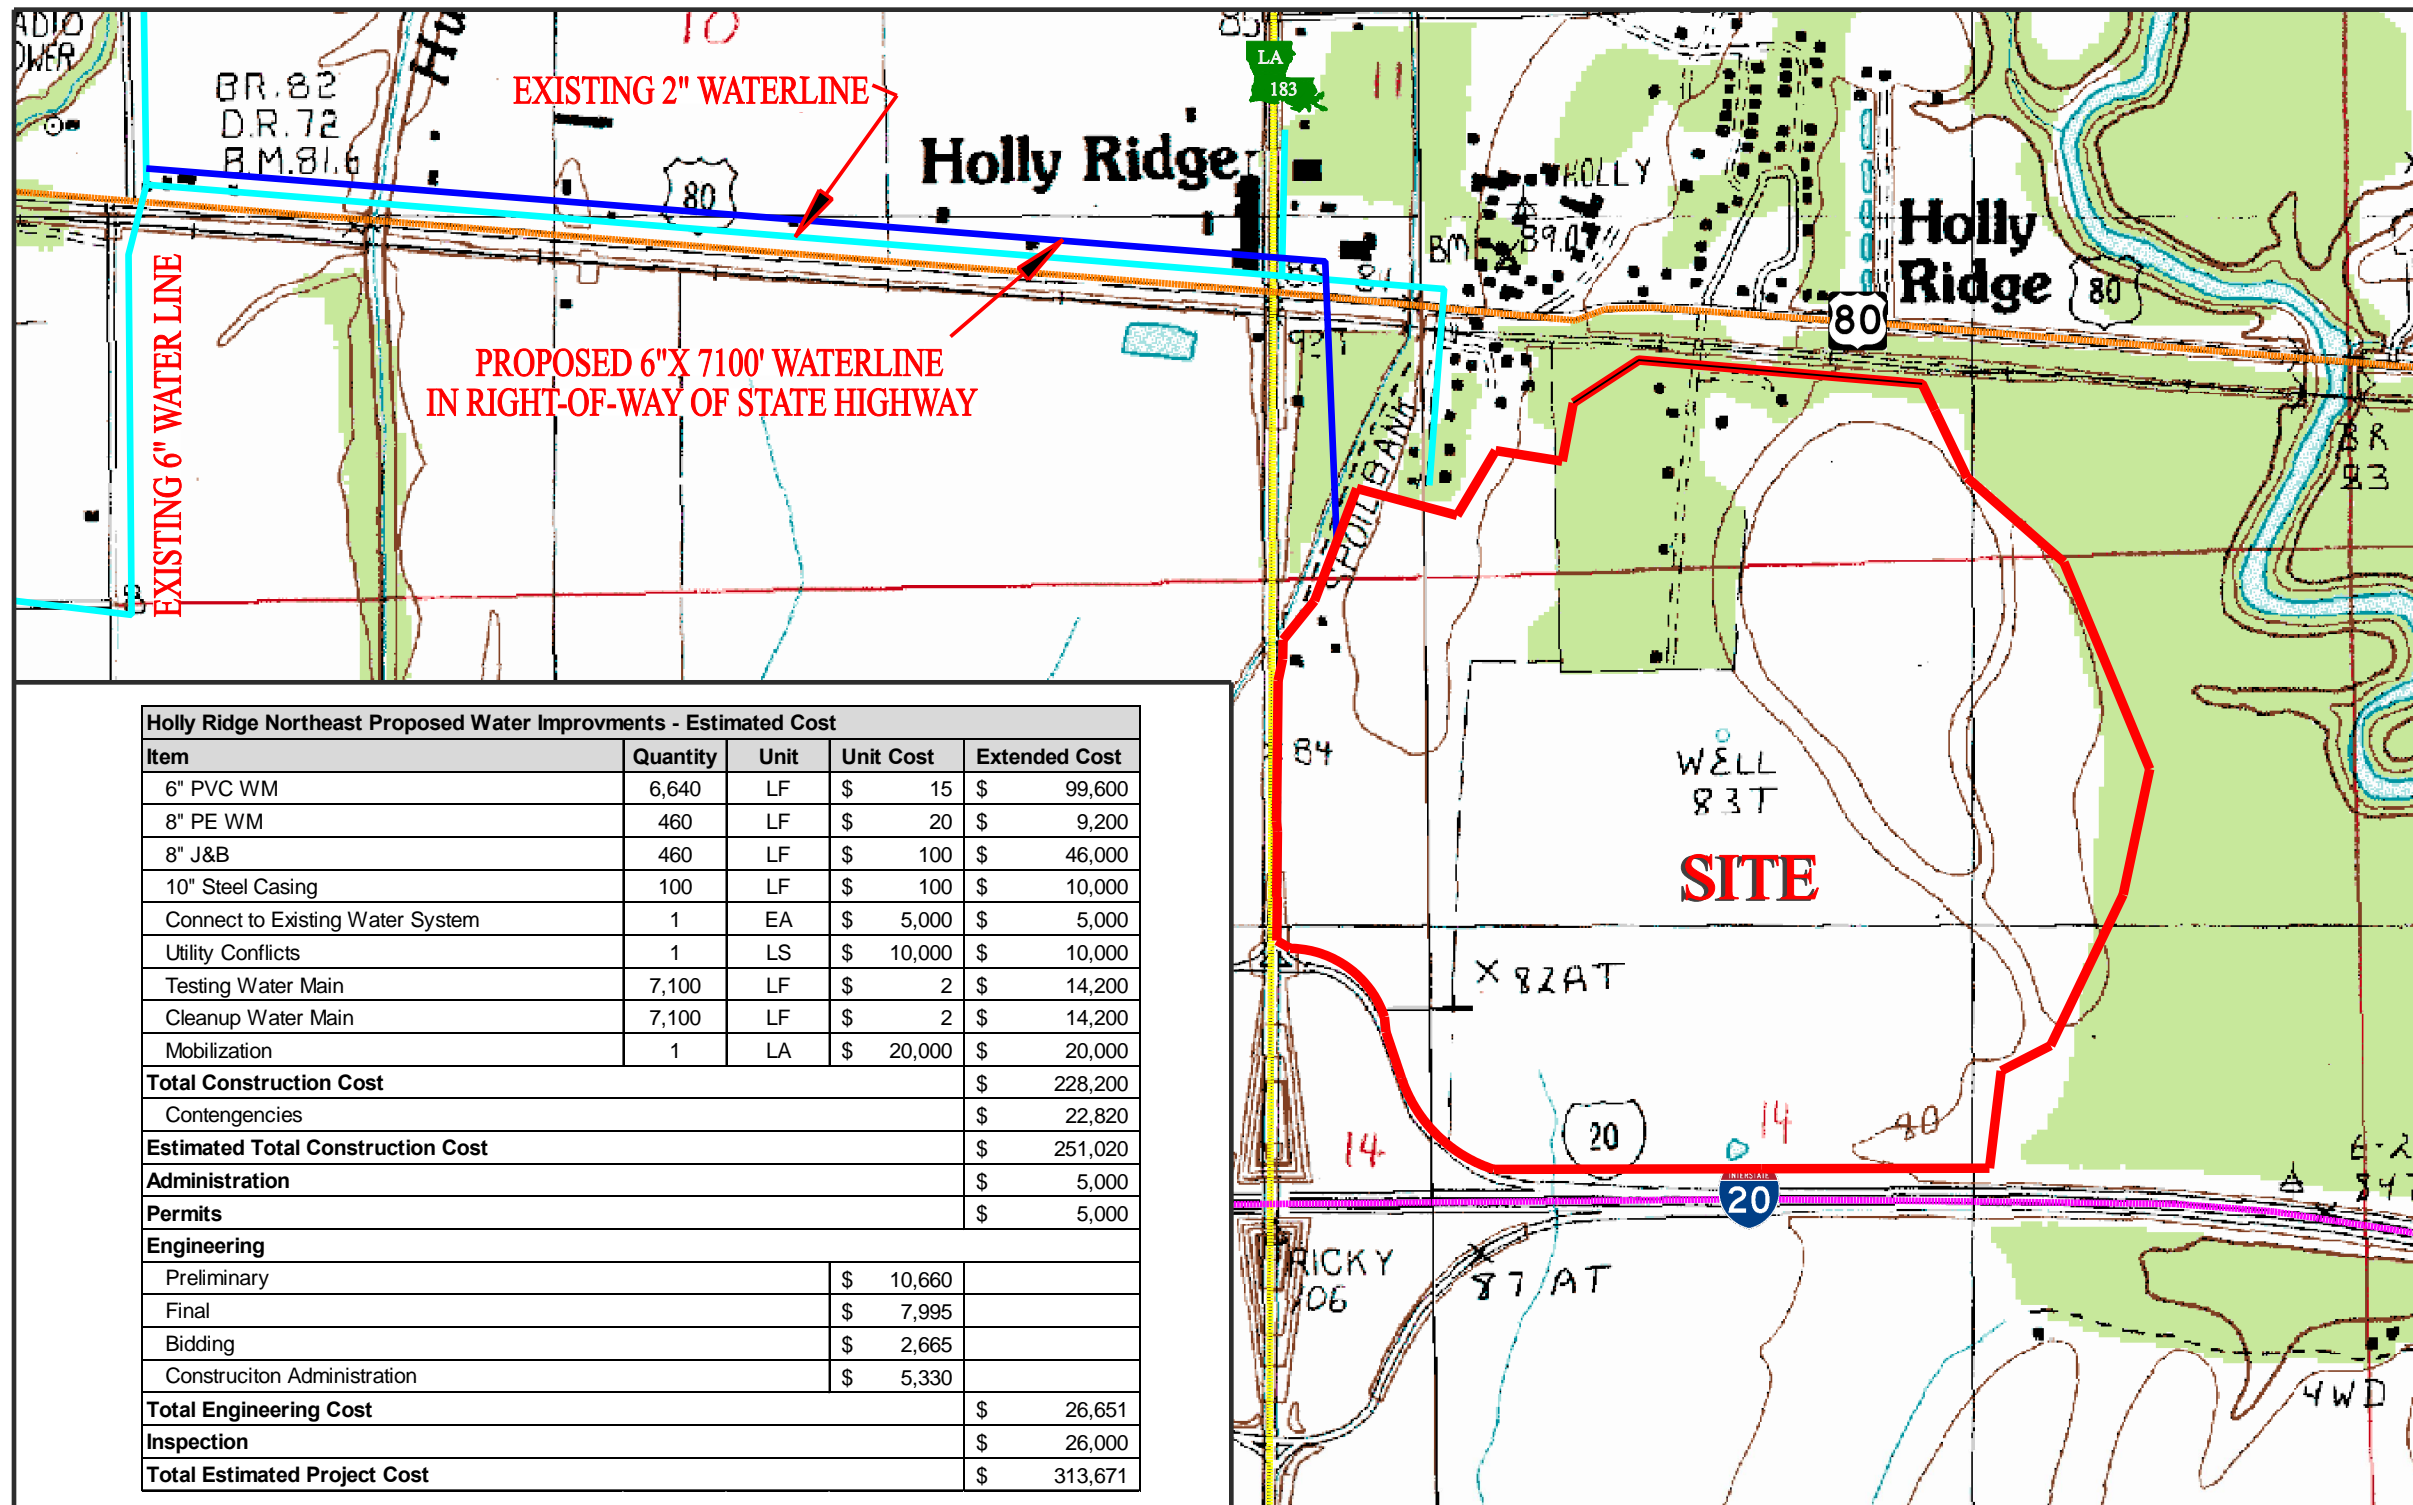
# EXHIBIT F. HOLLY RIDGE NORTHEAST SITE, EXISTING AND PROPOSED POTABLE WATER INFRASTRUCTURE MAP
